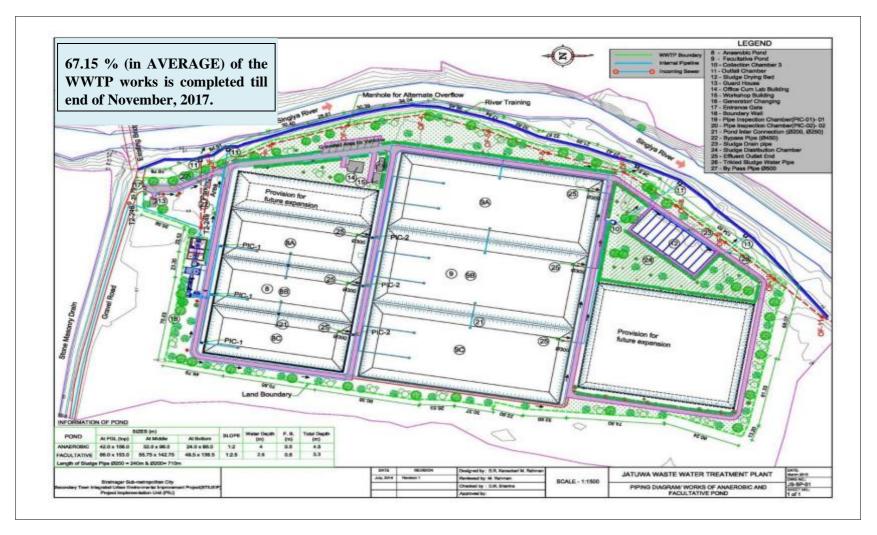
PROPOSED WASTE WATER TREATMENT PLANT at JATUWA in BMC
